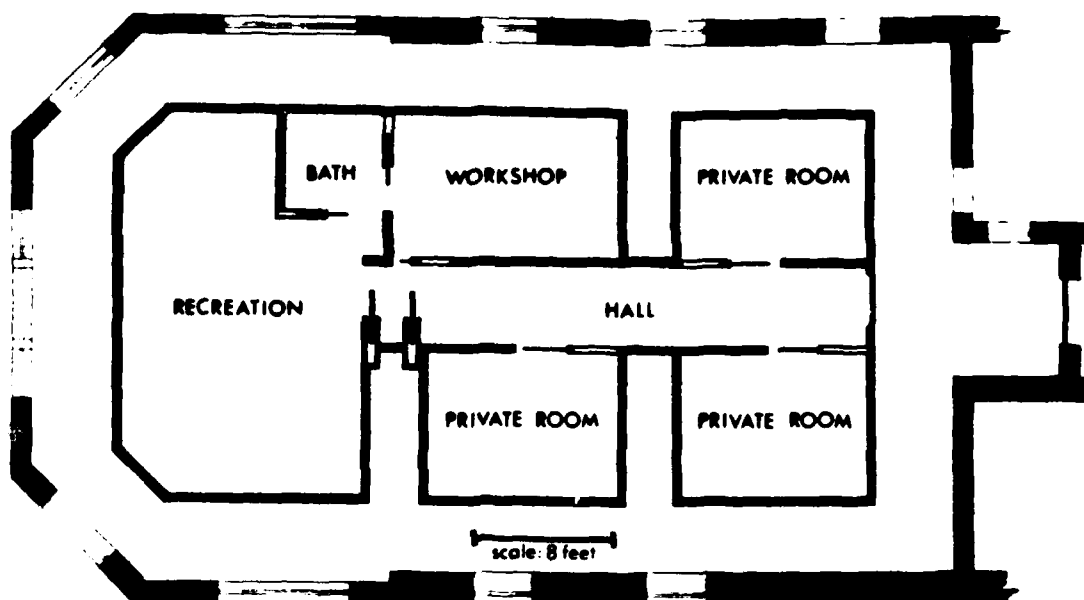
The floor plan of the laboratory and its position within the surrounding building shell.
